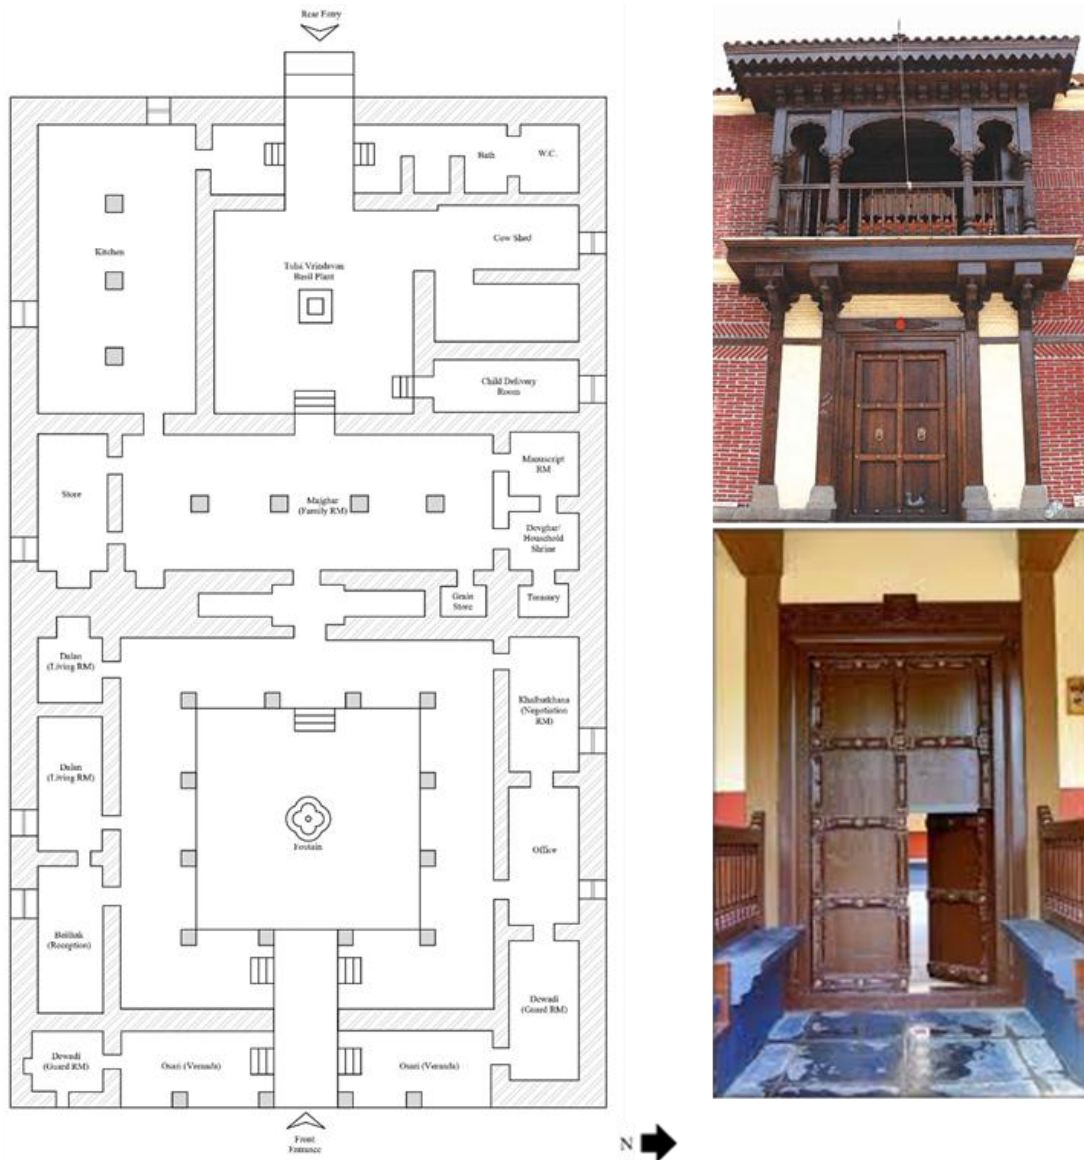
Typical Plan I, Entrance, and Main Door (Source: Authors)
